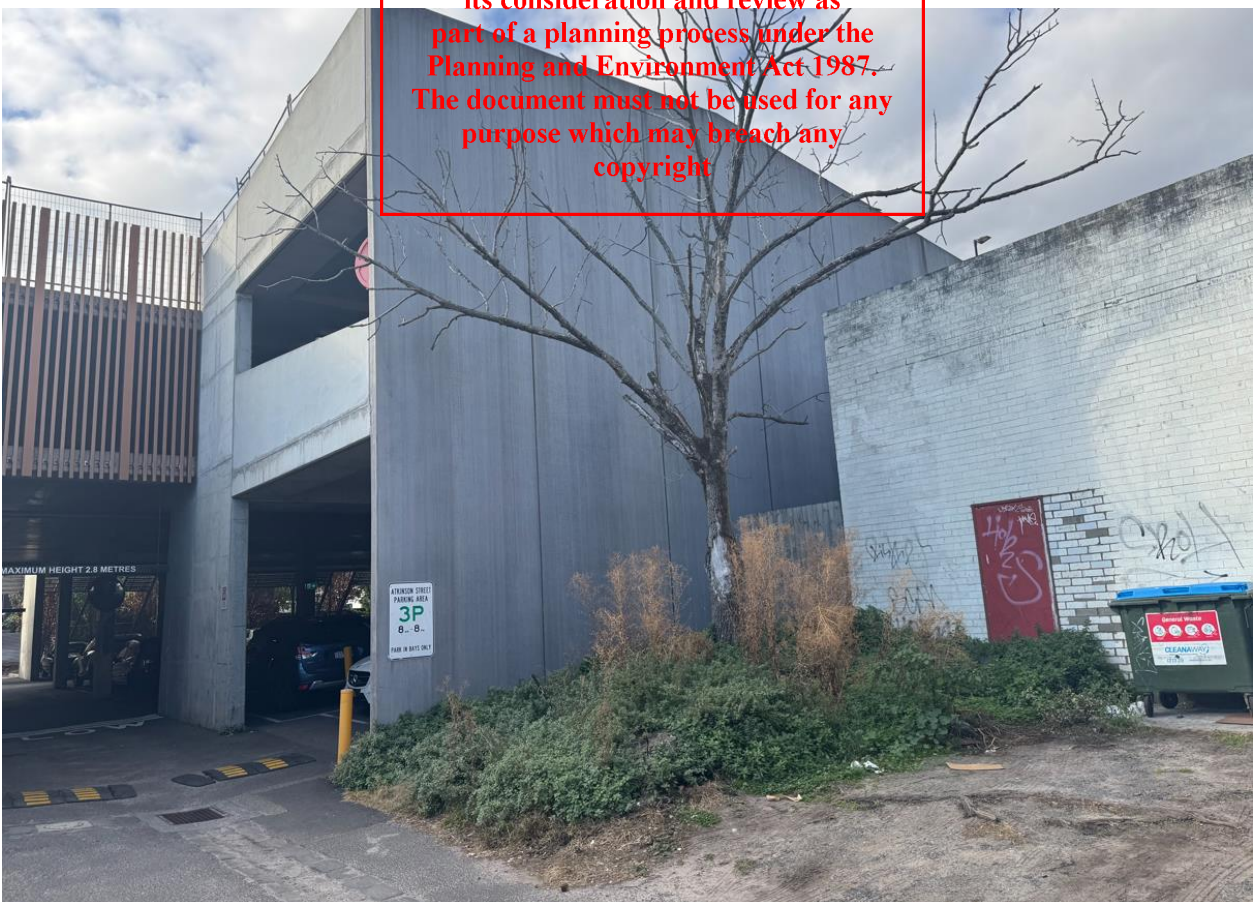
Subject site – view from western side laneway (photo taken May 2025)
